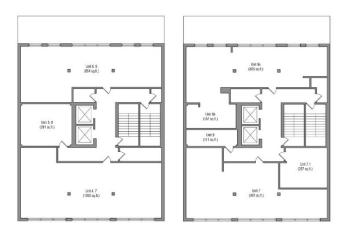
, 233 (left to right, top down): Building 8, third floor (1926); same floor (1981). 1'' = 32'. North is to the left.
